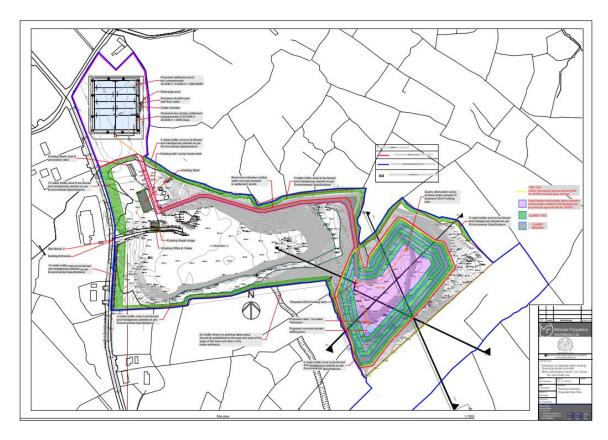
Site layout drawing showing location of existing quarry and proposed extension to area of extraction.
